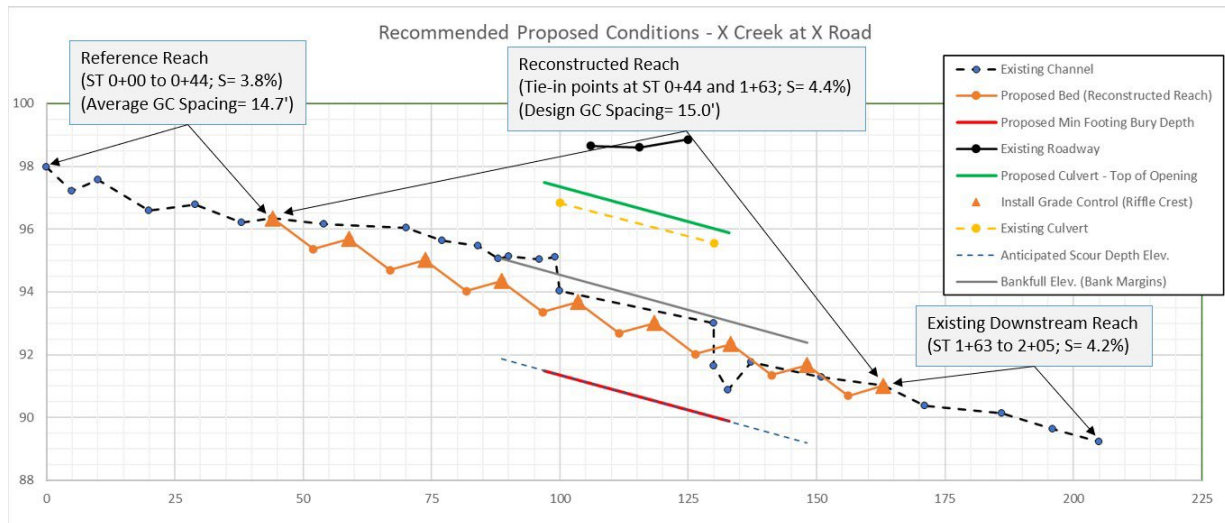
Longitudinal Profile with Proposed Reconstructed Reach
